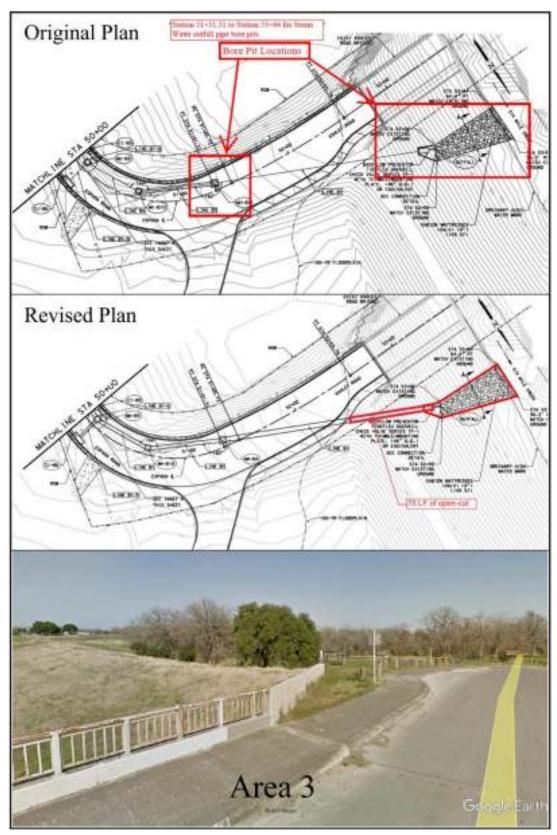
Original (top) and revised (middle) plans for monitoring of Area 3 with Google Earth street view (bottom) prior to construction.
